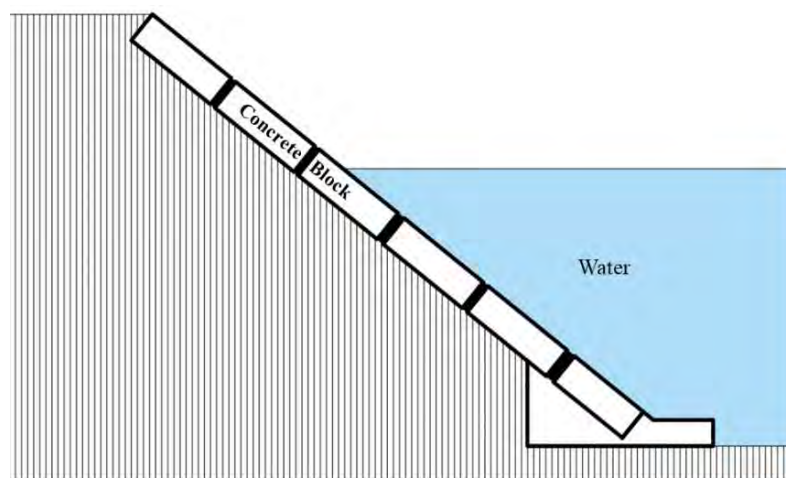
Concrete-constructed block wall (ELITE PRECAST CONCRETE, 2017)
